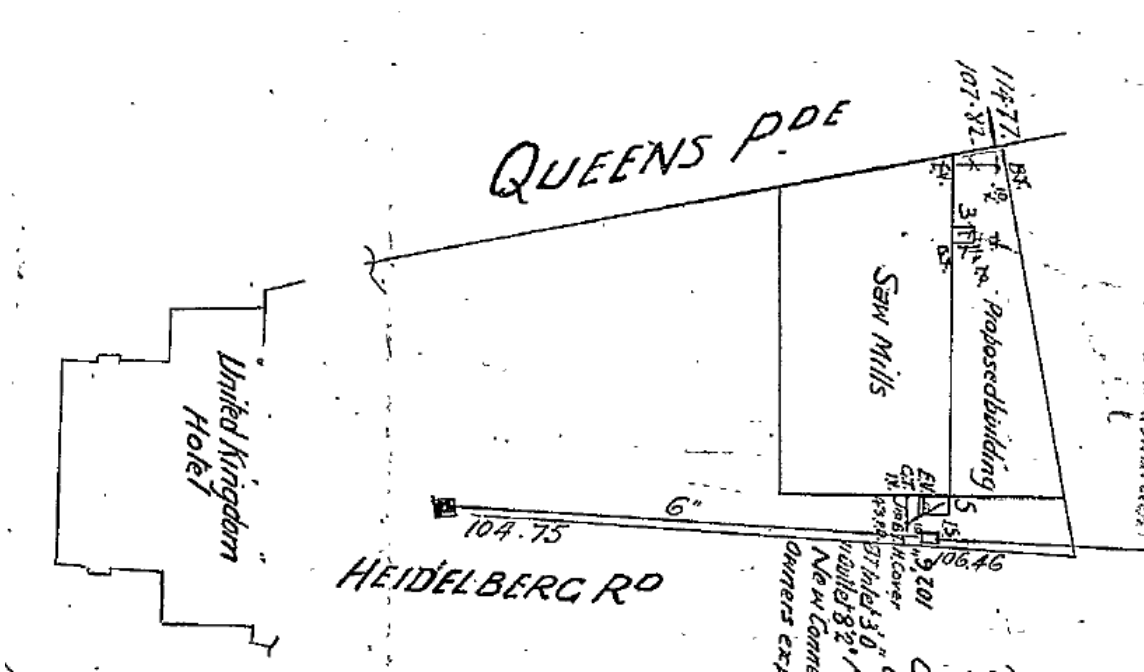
The site of the proposed building for owner John Markby – plans dated 1918 (PSP No. 53990).
